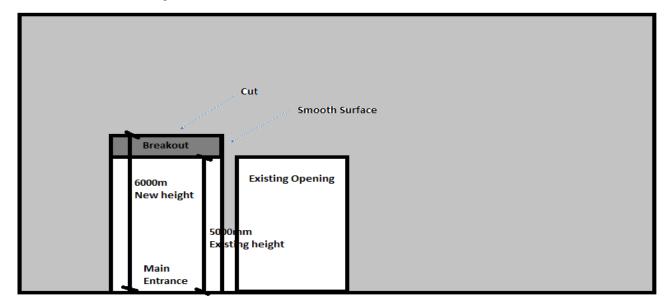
Marking out of the LLW Building Outer Wall (Gridline DI)
